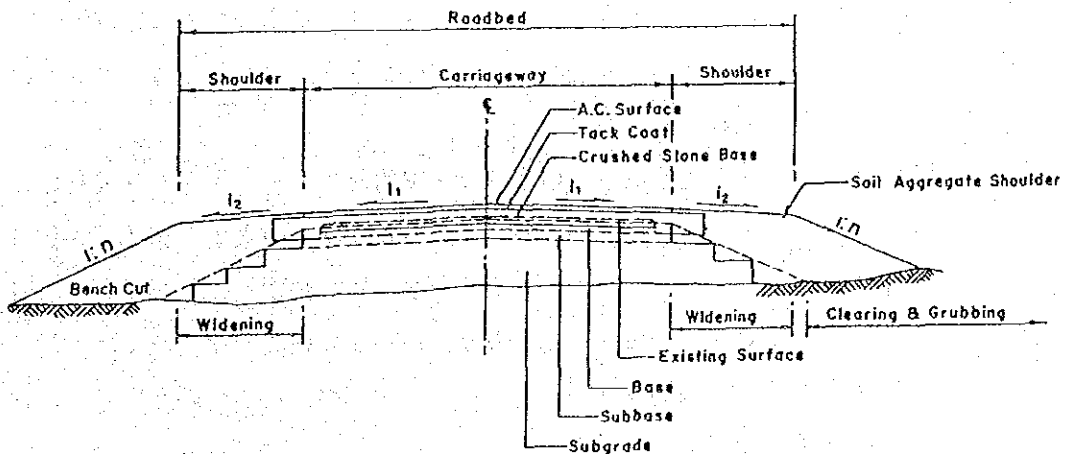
TYPICAL OVERLAY AND RECONSTRUCTION SECTIONS
